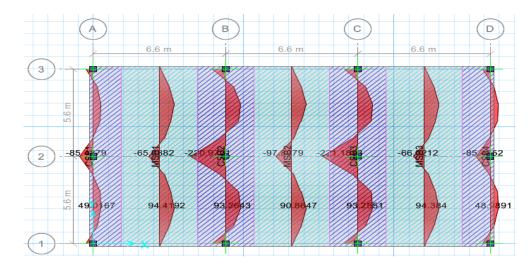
Along shorter side reinforcement(SAFE:BS, without staggered column)
